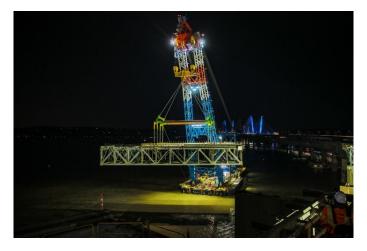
I Lift NY raises a large section of the old bridge near the Westchester
